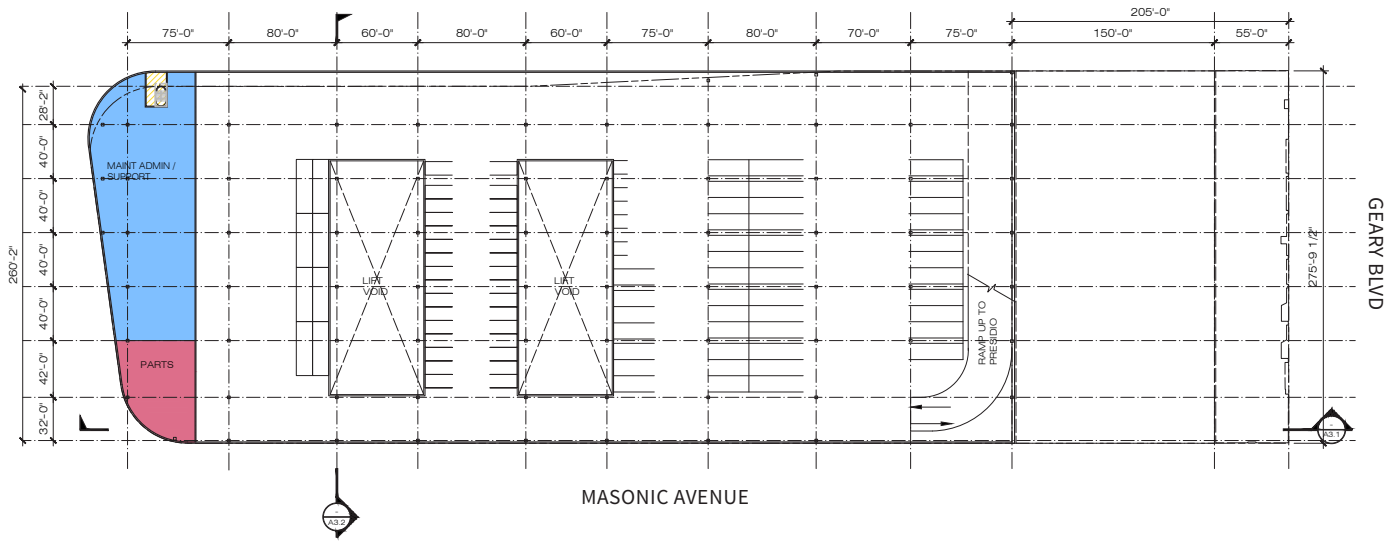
BUS FACILITY CONCEPT DESIGN - BASEMENT LEVEL PLAN
